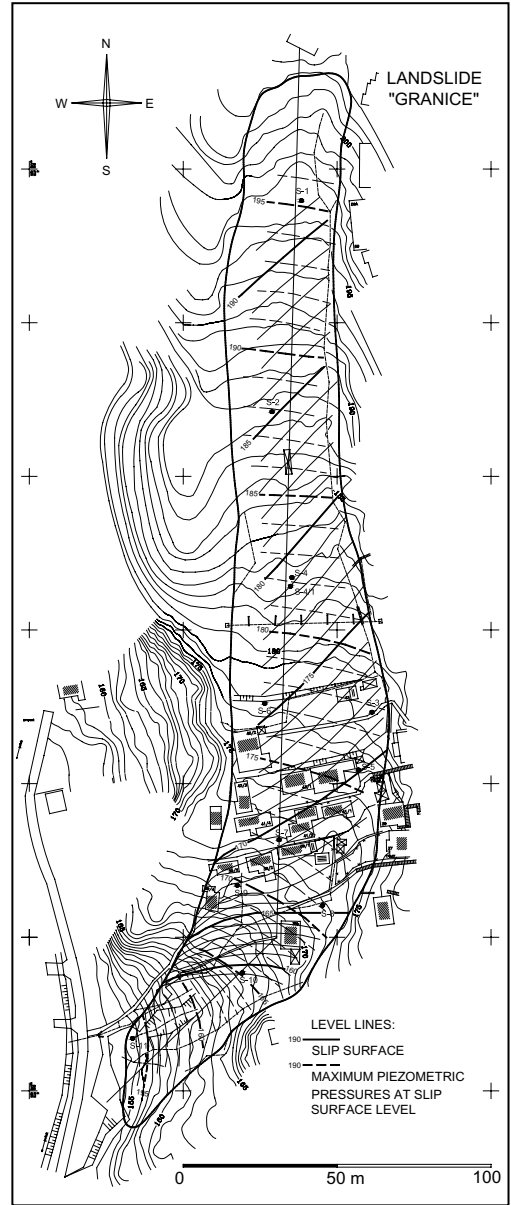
Landslide “Granice” on topographic plan made in 1995. The passages and stairs beside east side are not in straight lines any more.
